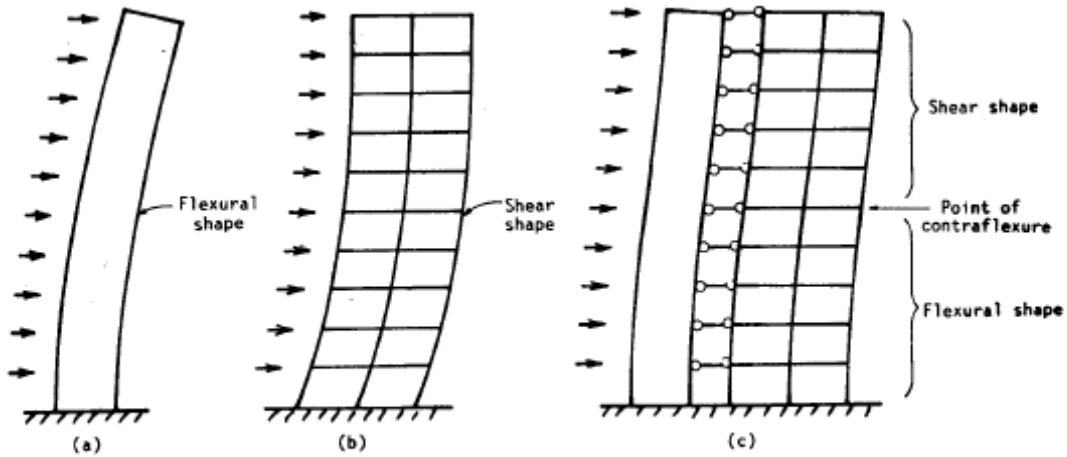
Interaction of shear wall - frame structure and behavior of components.
